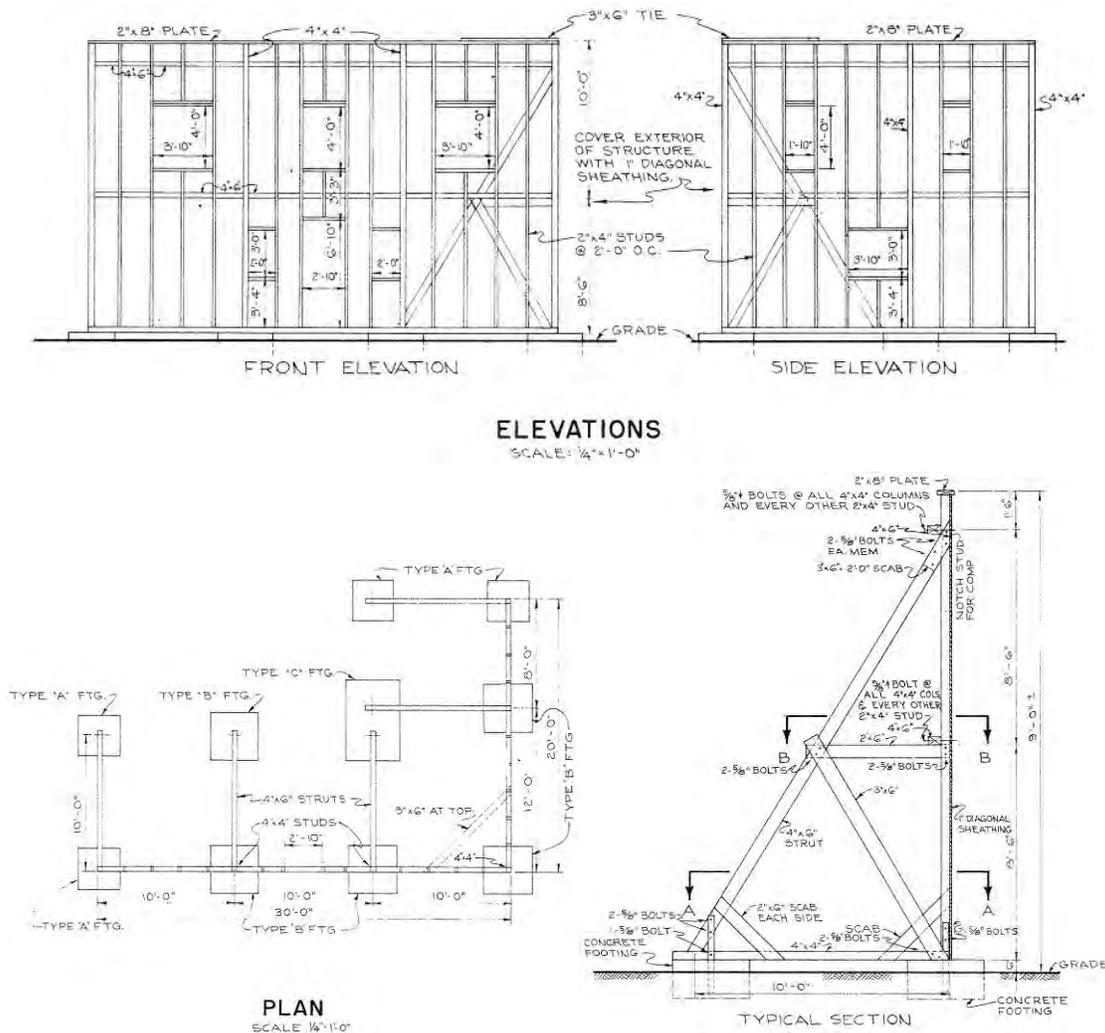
"Combat in cities" course dummy building elevations, plan, and section, 1952 (standard drawing 28-13-01 sheet 6 of 9; "Combat in cities" course, dummy building, plan, elevations, and details; 20 June 1952).
